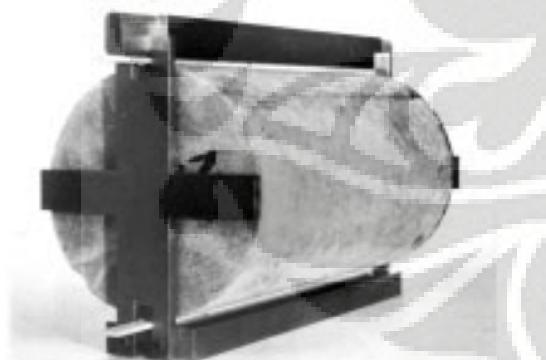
Jig for Aligning Concrete Cylinder and Bearing Strips
